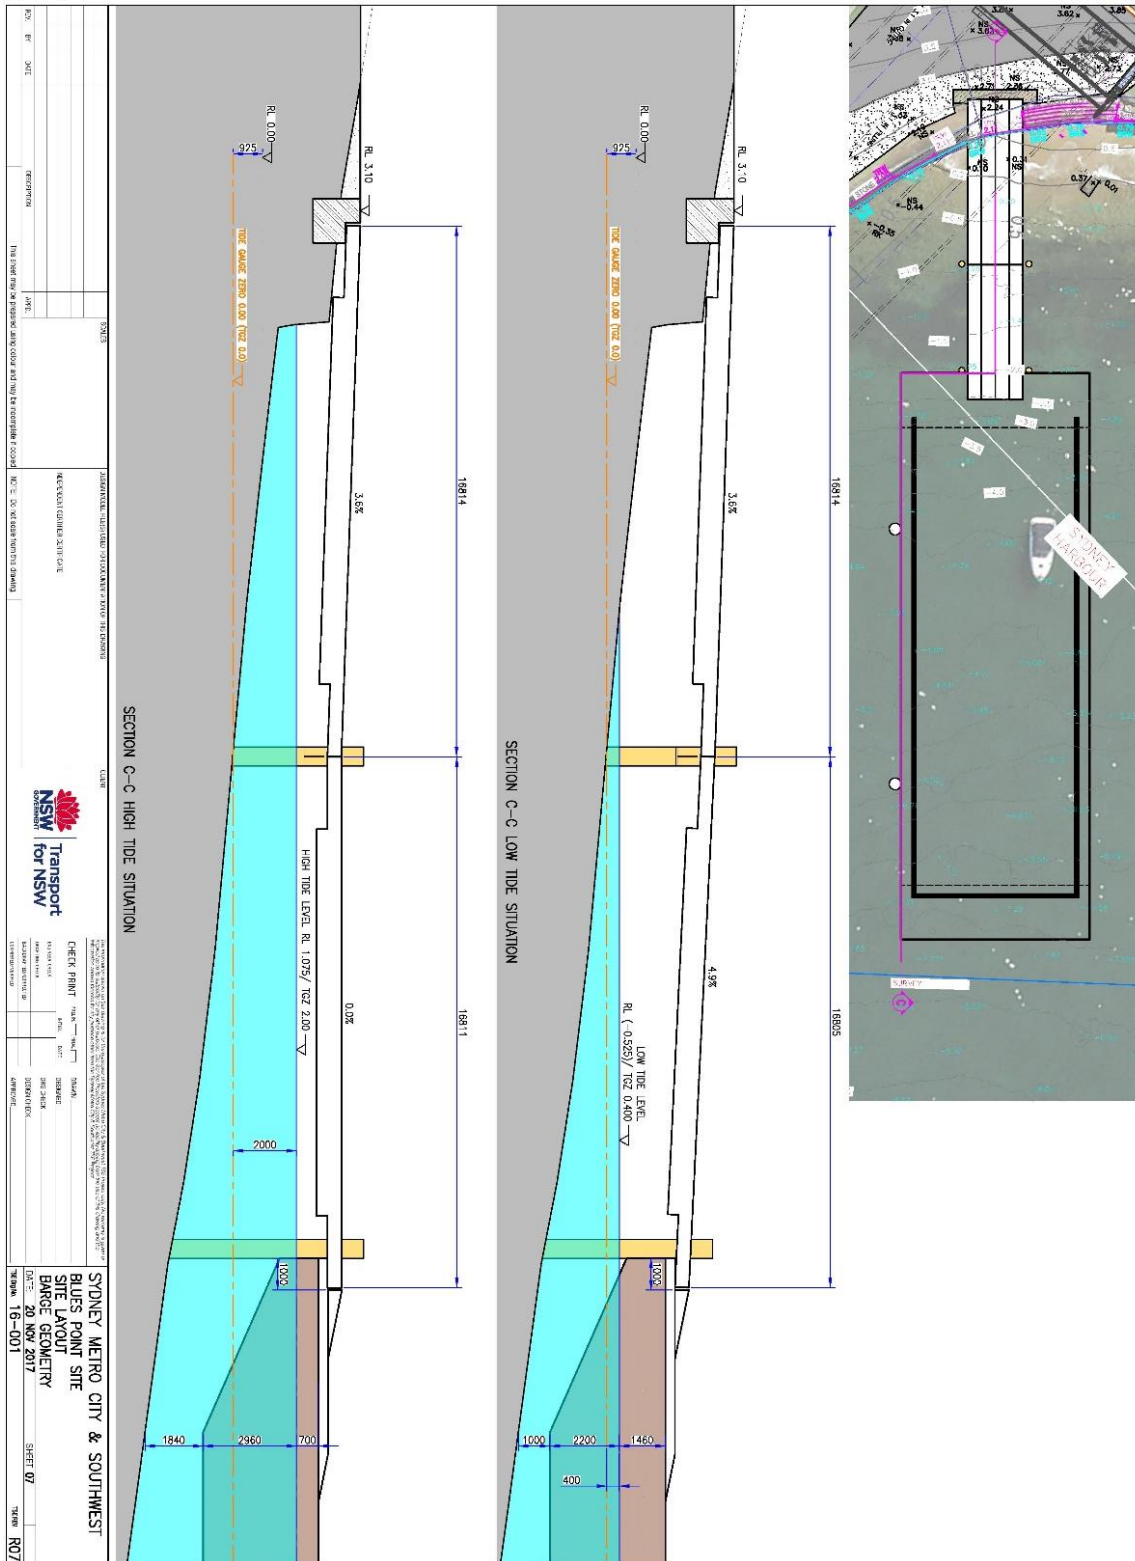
Indicative concept drawing of the proposed barge with ramp. Sydney Metro City & Southwest, Blues Point Site, Site Layout Overall Plan, 20/11/2017, Sheet 07, 16-001, R07
